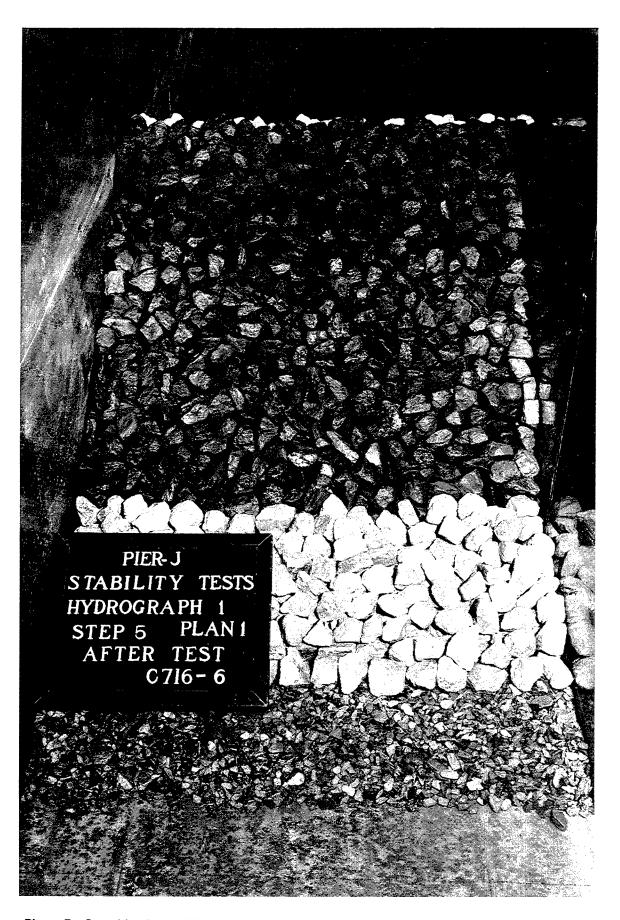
Sea-side view of Plan 1 after testing step 5 of Hydrograph 1
